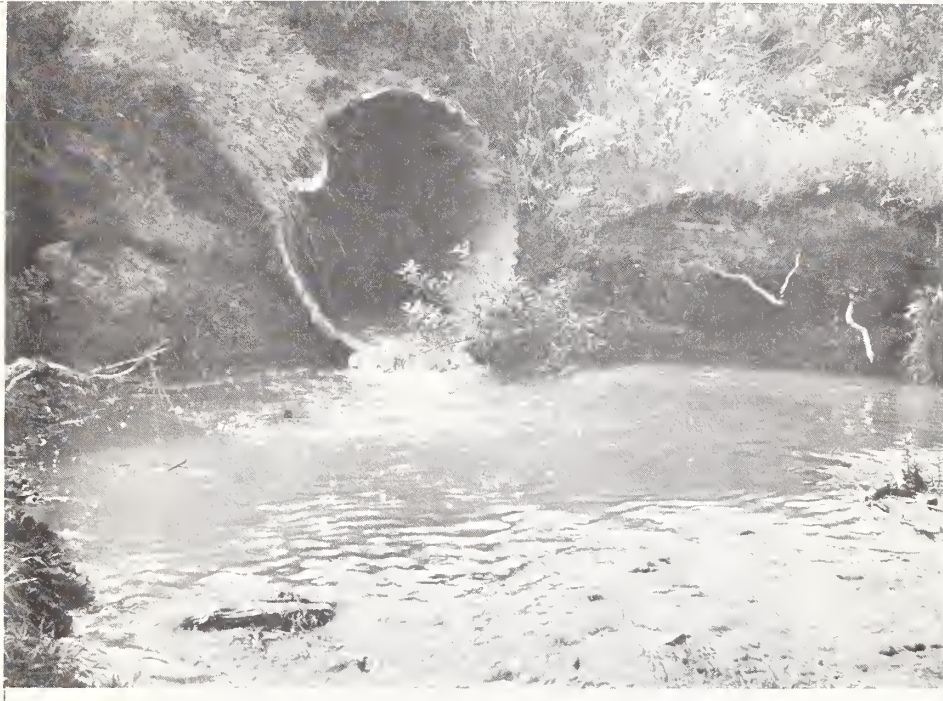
OUTLET SCOUR HOLE AT PROJECT CULVERT NO. 5
